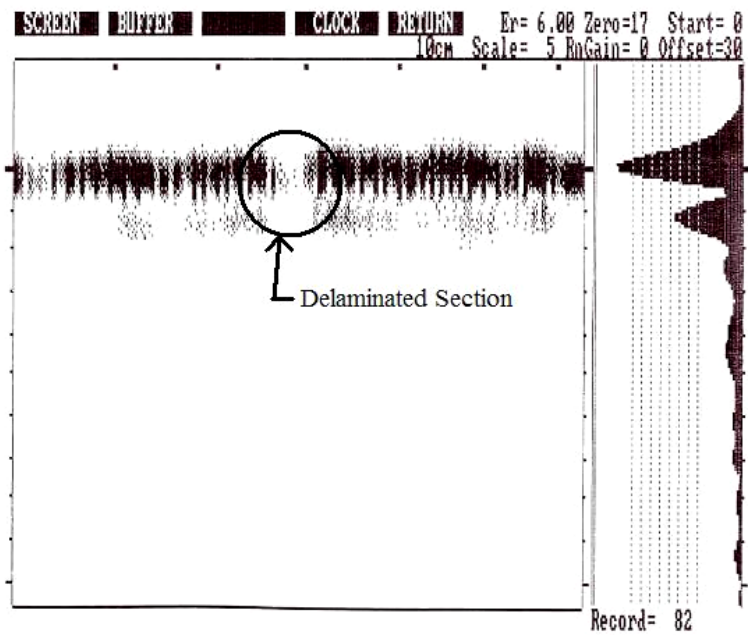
GPR image of deck profile on bridge C-635.
